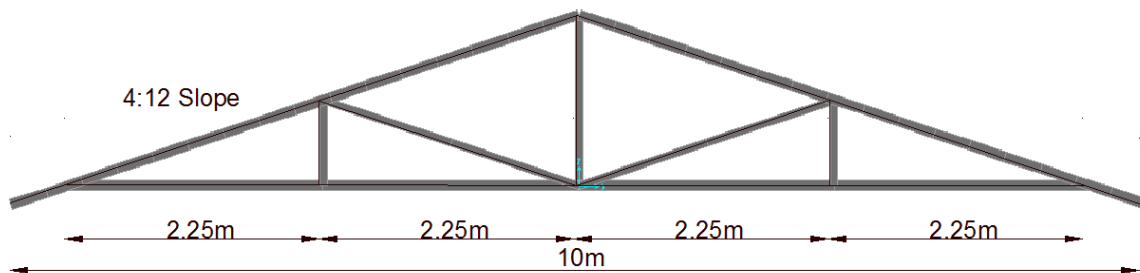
Elevation view and dimensions of interior Howe-style truss
